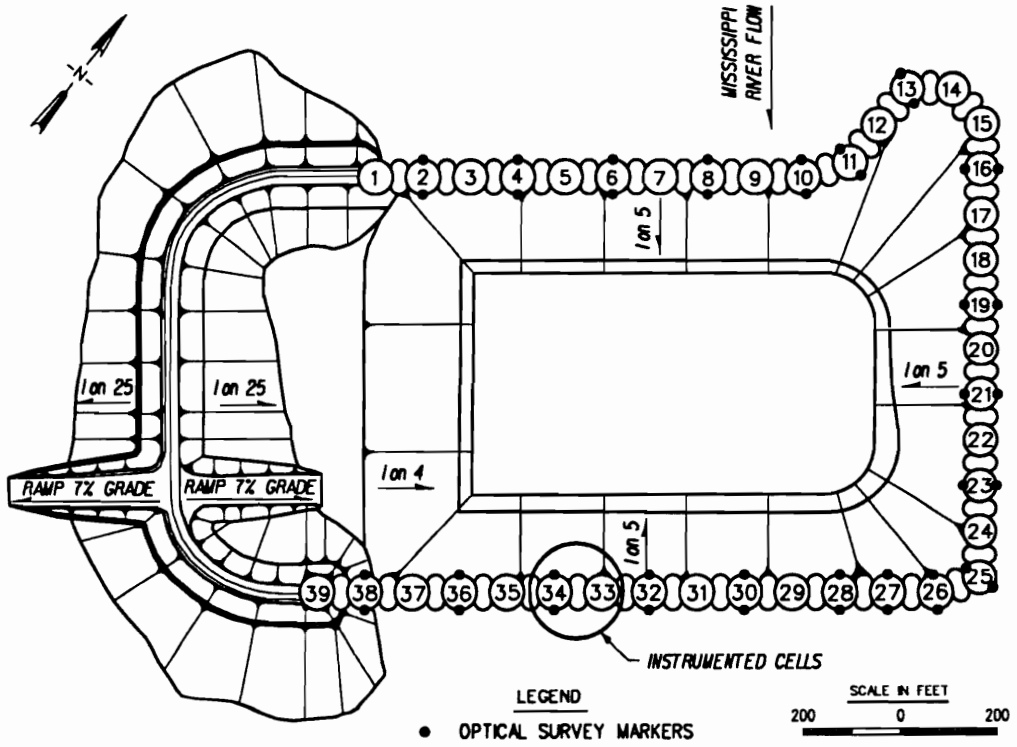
Plan view of the first-stage Lock and Dam No. 26(R) cofferdam.
